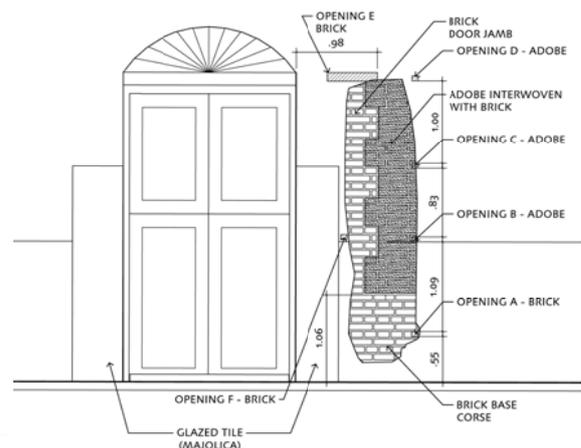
Prospection in Hotel El Comercio. Fired brick masonry surrounds the openings in first floor and also conforms the base course[1].
